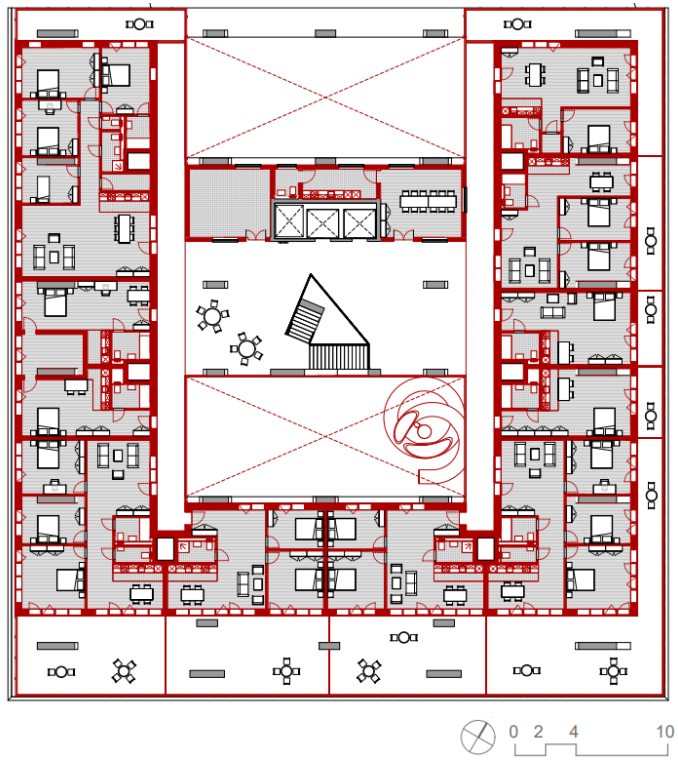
Plan of the 4th floor extracted from the digital model from Revit.
